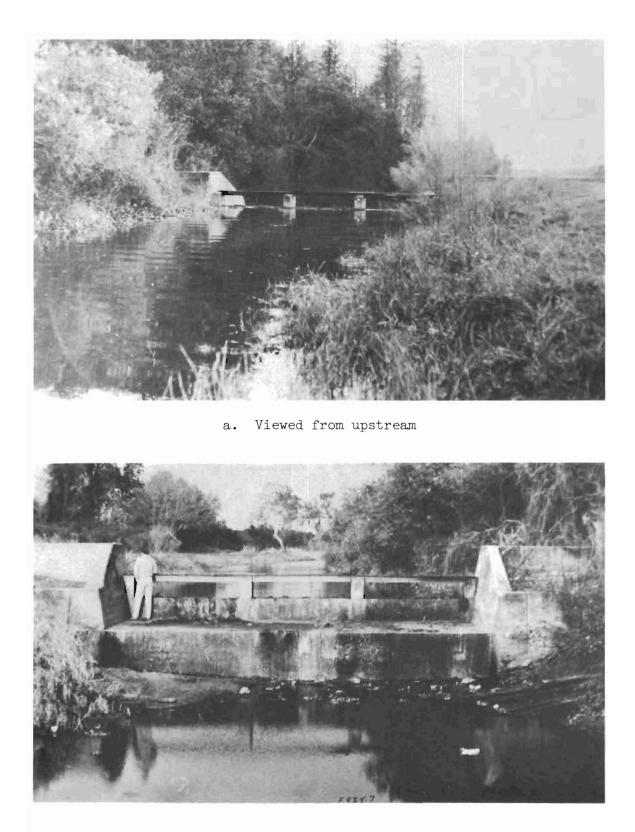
Outlet control structure (structure 3) for Lake Mare Prairie
